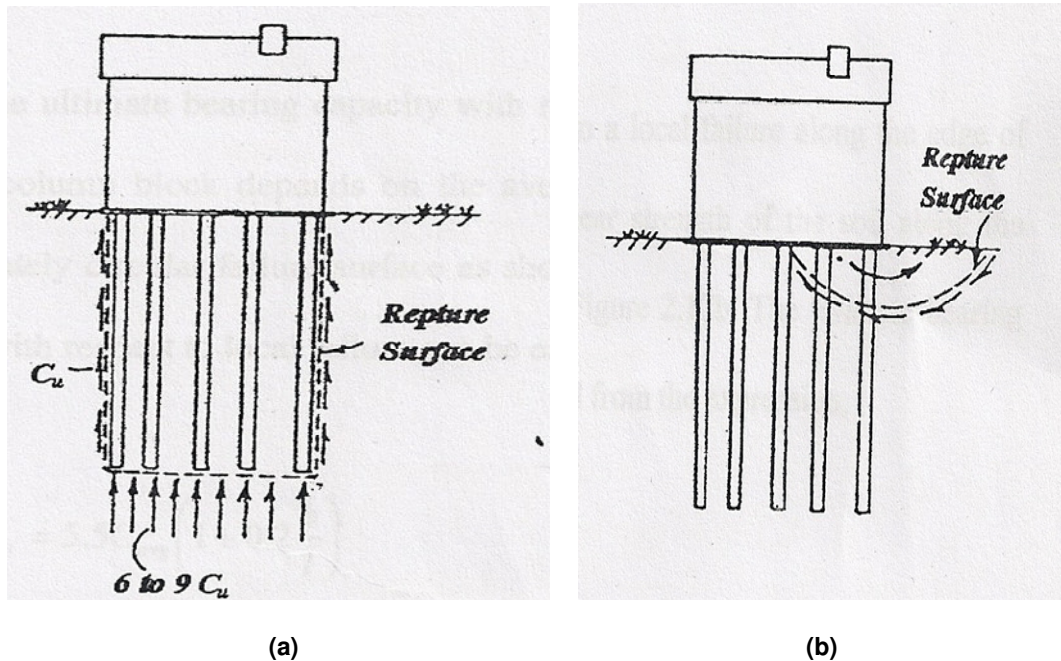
Failure mode of lime-column foundations. (a) Block failure; (b) Local shear failure.
